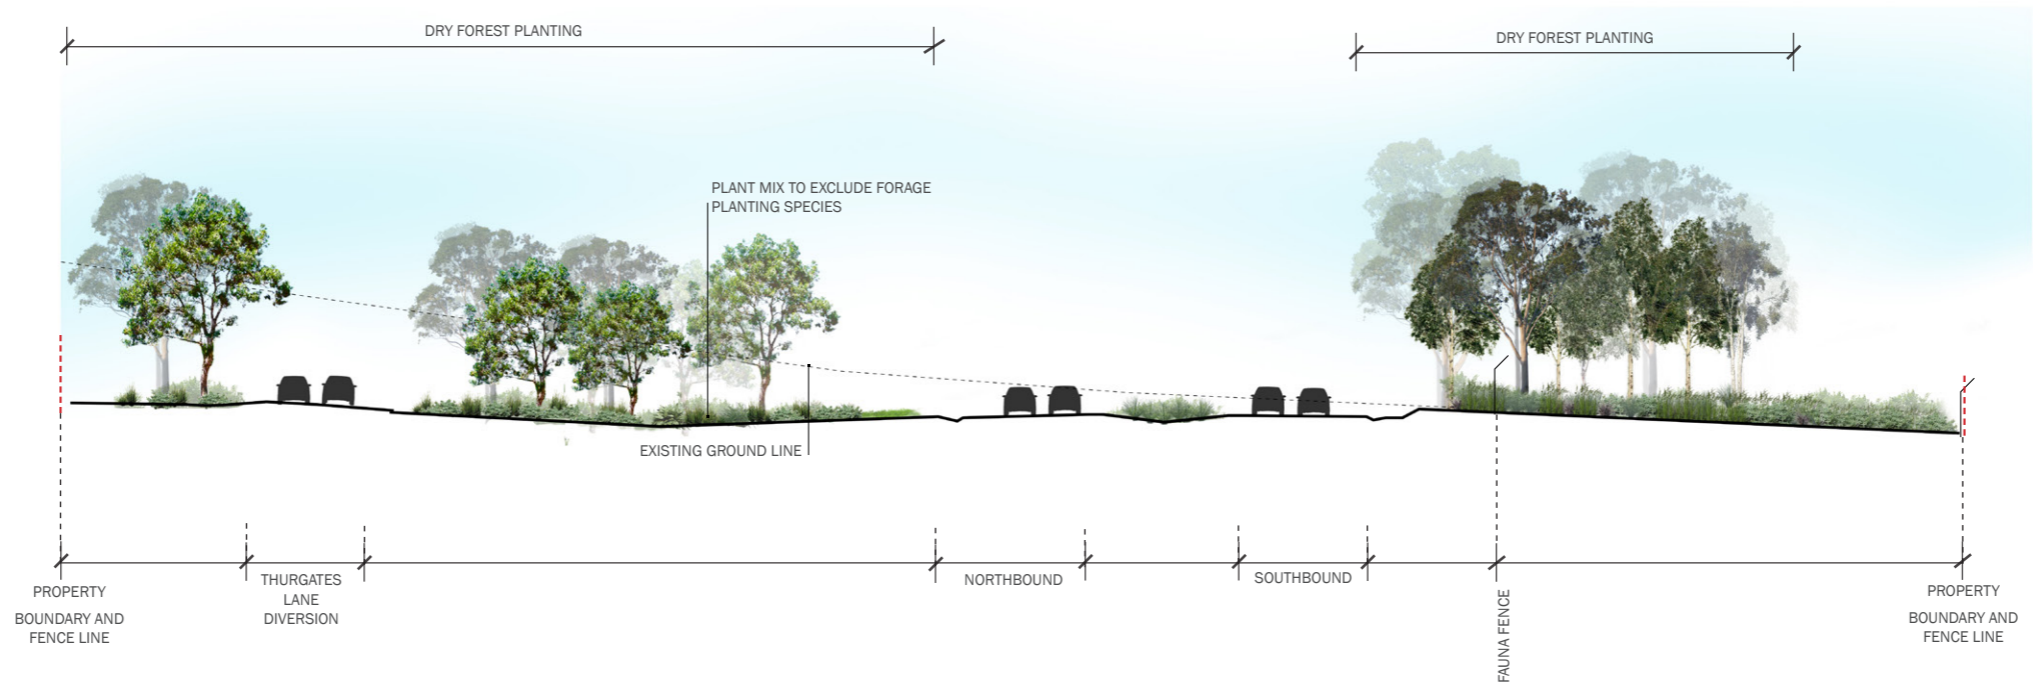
Cross Section D-D in Wardell (Scale 1:400) Note: Fence locations and types are to be confirmed, and subject to further design development
